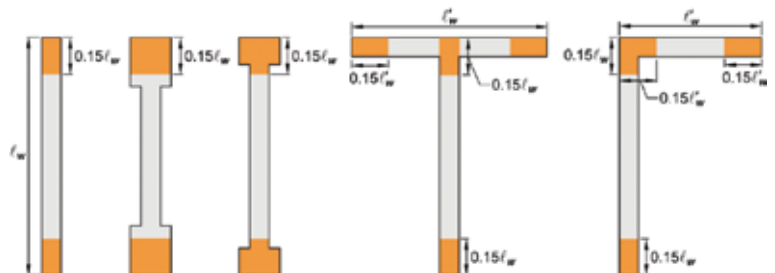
Various wall configurations showing end regions requiring longitudinal reinforcement per 18.10.2.4(a) (ACI 318-19, Fig. R18.10.2.4')
